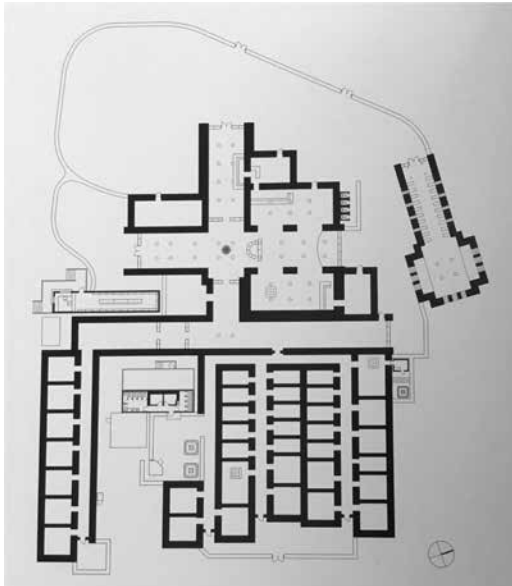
5. : The typical floor of Hotel de Glace in Canada. (Source: R. Slavid: Extreme architecture, Laurence King Publishing, London, 2009, p. 85,86.)
